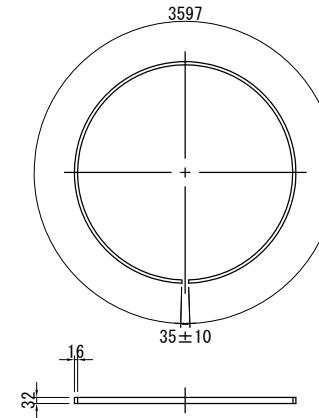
DETAIL OF PILE TOP CONNECTION TO THE BASE CONCRETE OF P18 PIER S=1:40
